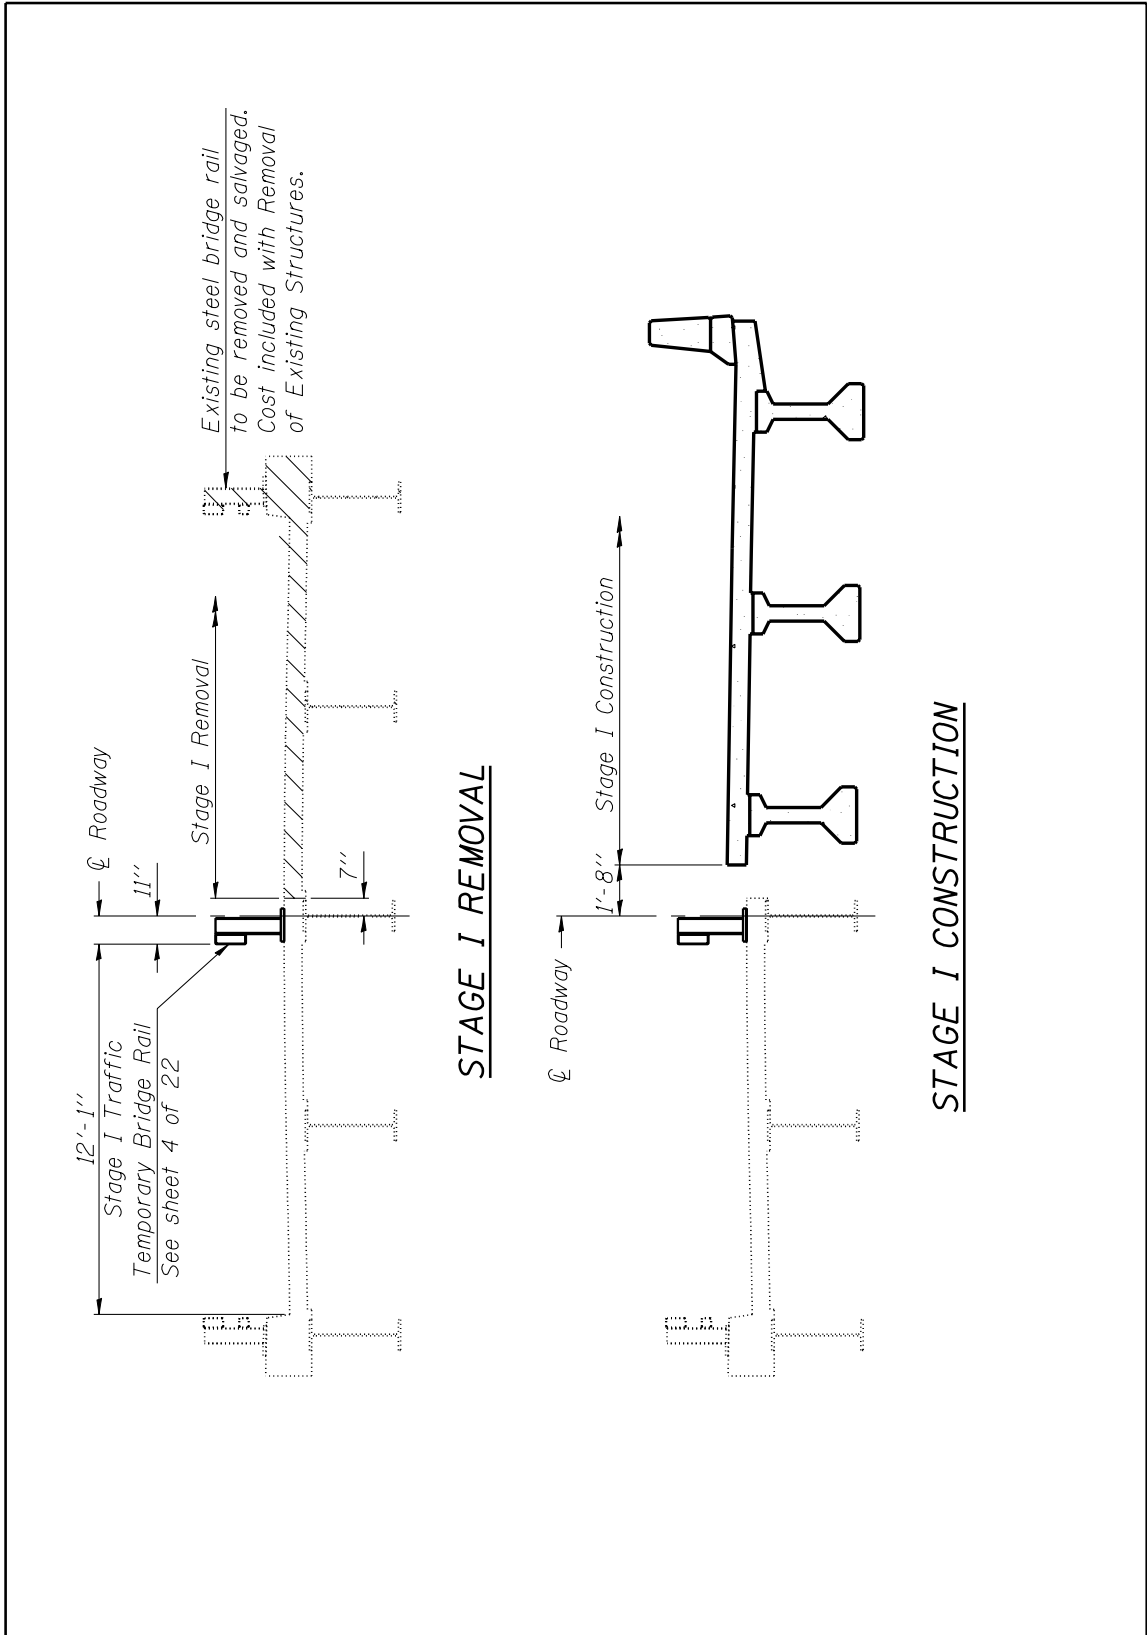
Acceptable Detailing for Stage I Removal and Construction
